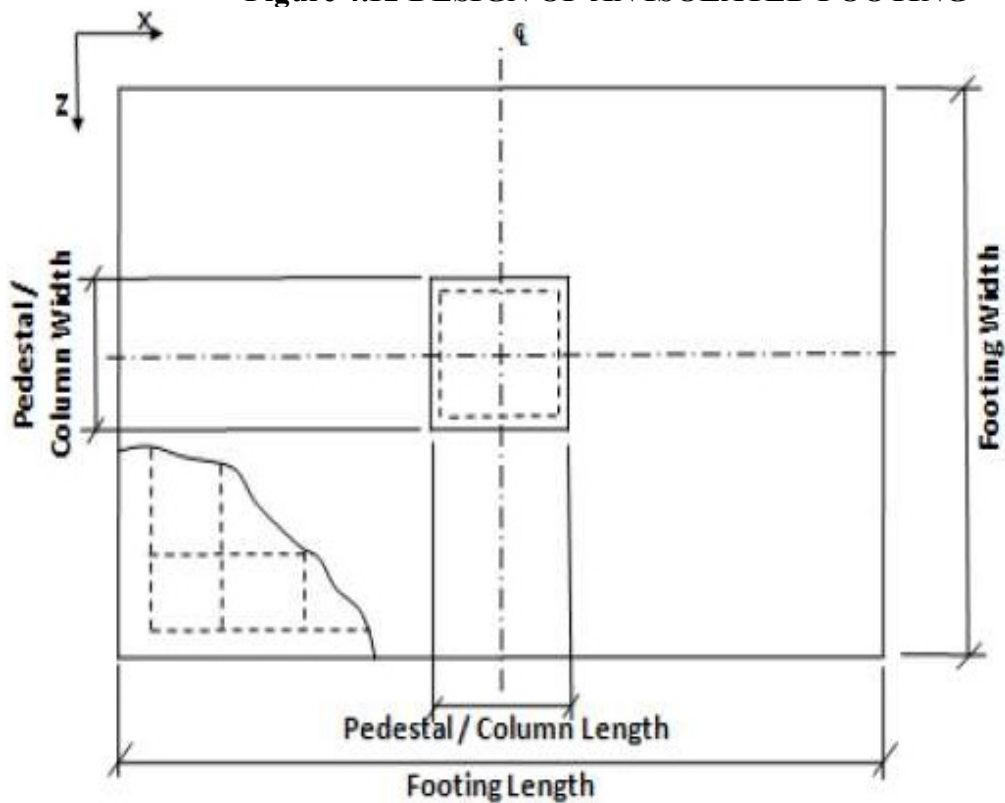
PLAN OF AN ISOLATED FOOTING
